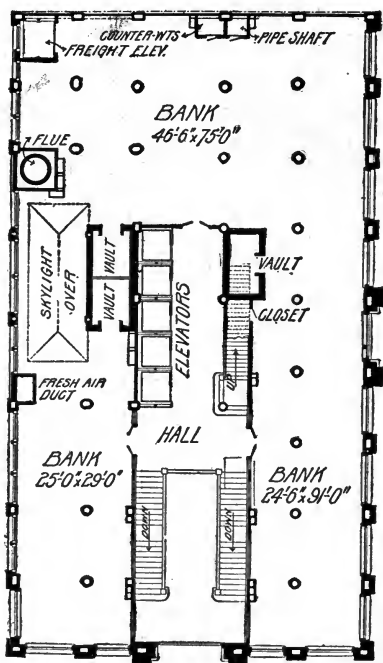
New York Life Insurance Building, Chicago. Plan of Banking Floor.
